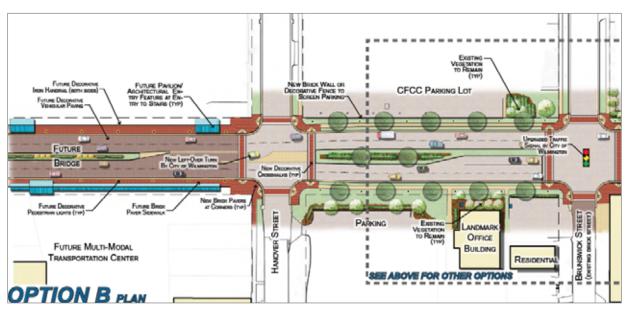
Design Concept for North 3rd Street Streetscape Improvements (Kimley-Horn/URS)
